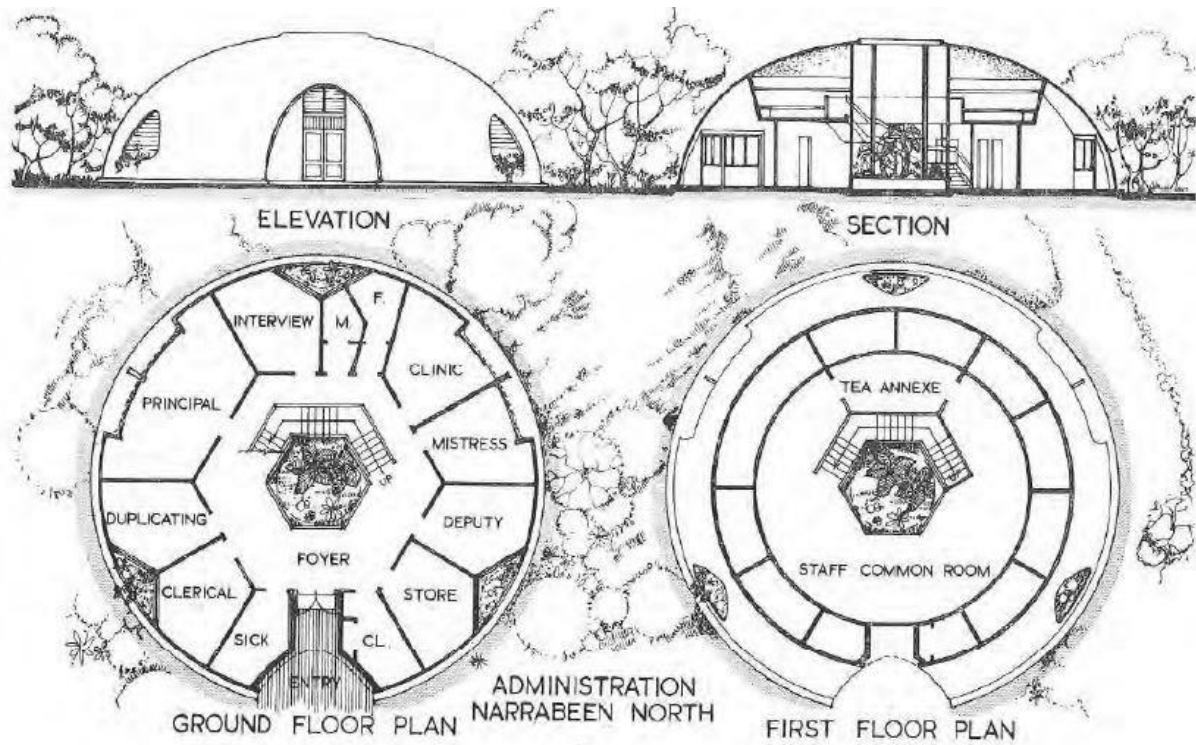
Plans, Section and Elevation for the Administration building, North Narrabeen Public School (Bini Shell A) (Source: Reproduced in construction of Binishell reinforced concrete domes, Department of Public Works, 1978, p. 9, cited in Betteridge, 2018, p. 22).
